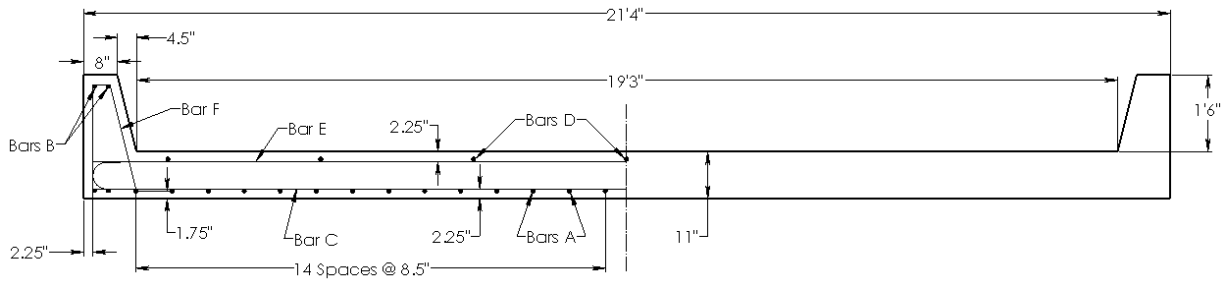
Bridge CS-9 Transverse Section (adapted from TxDOT 2018b)
